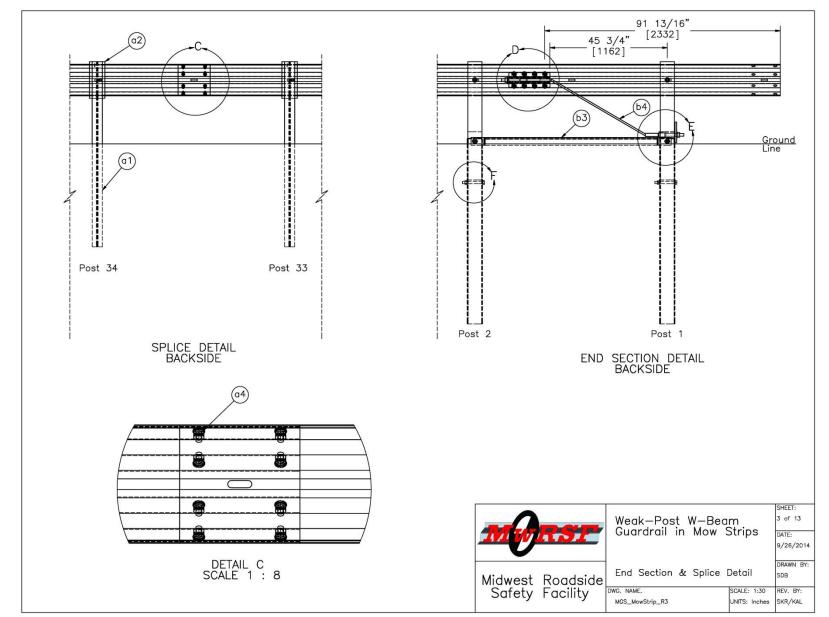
Anchorage and Splice Details, Test No. MGSMS-1
